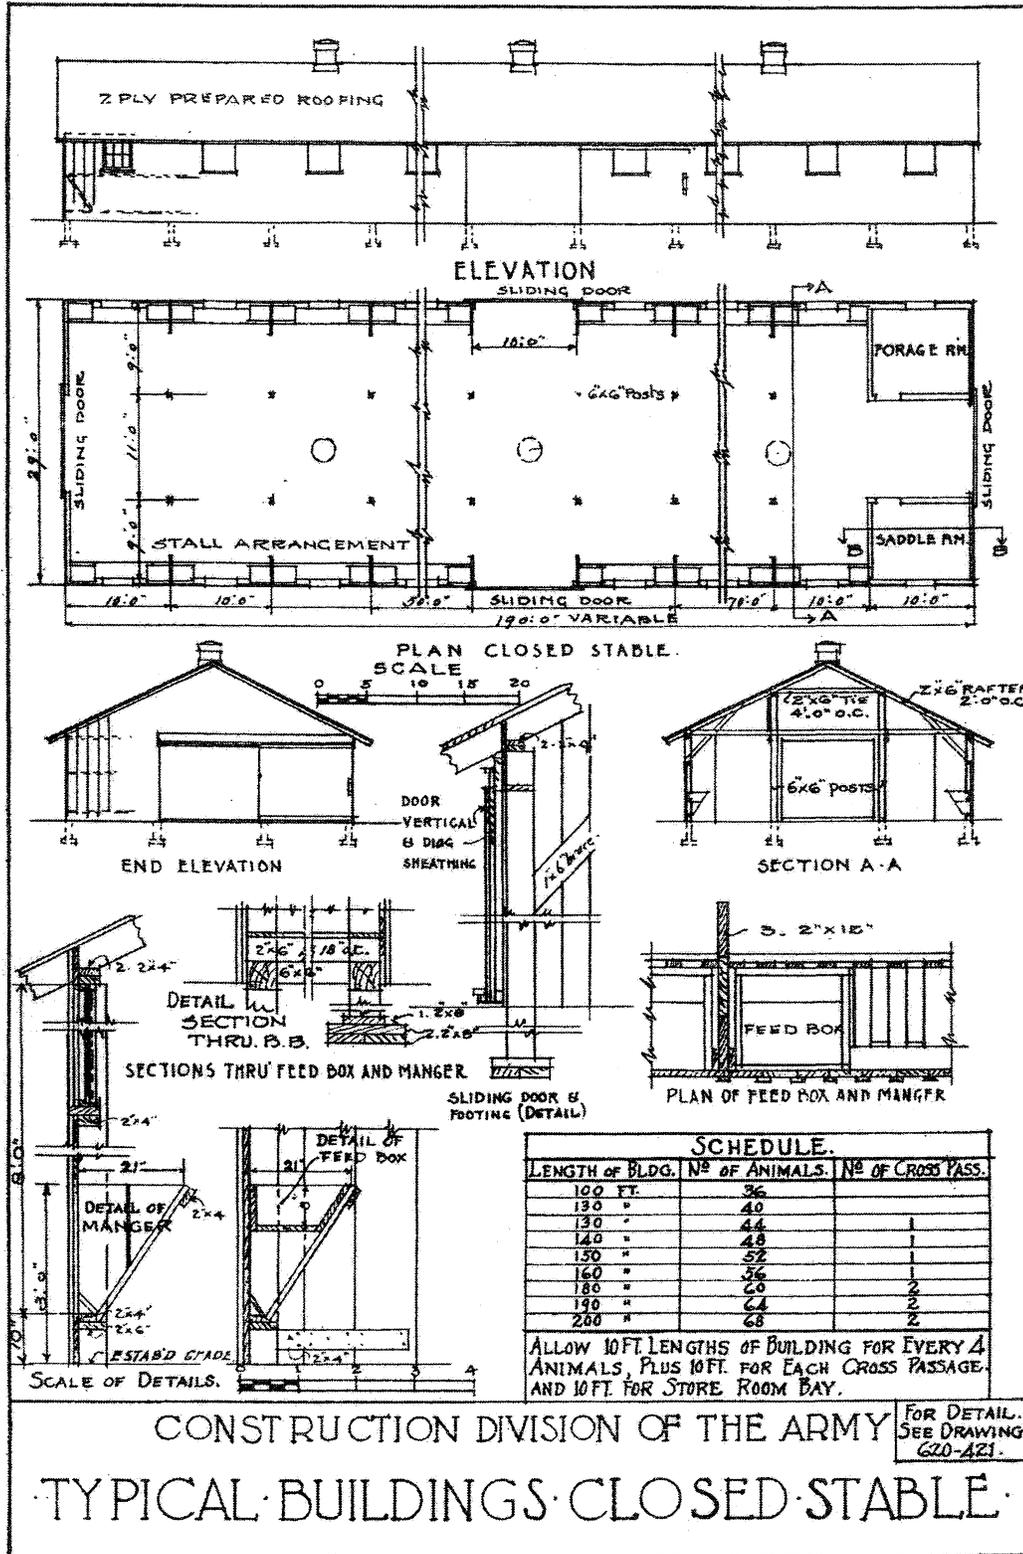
"TYPICAL BUILDINGS, CLOSED STABLE." A 1919 STANDARDIZED Q.M.C. PLAN VERY SIMILAR TO THAT OF FORT HUACHUCA'S CAVALRY STABLES (CONSTRUCTION DIVISION OF THE ARMY 1919:SECTION C PLATE 58).
